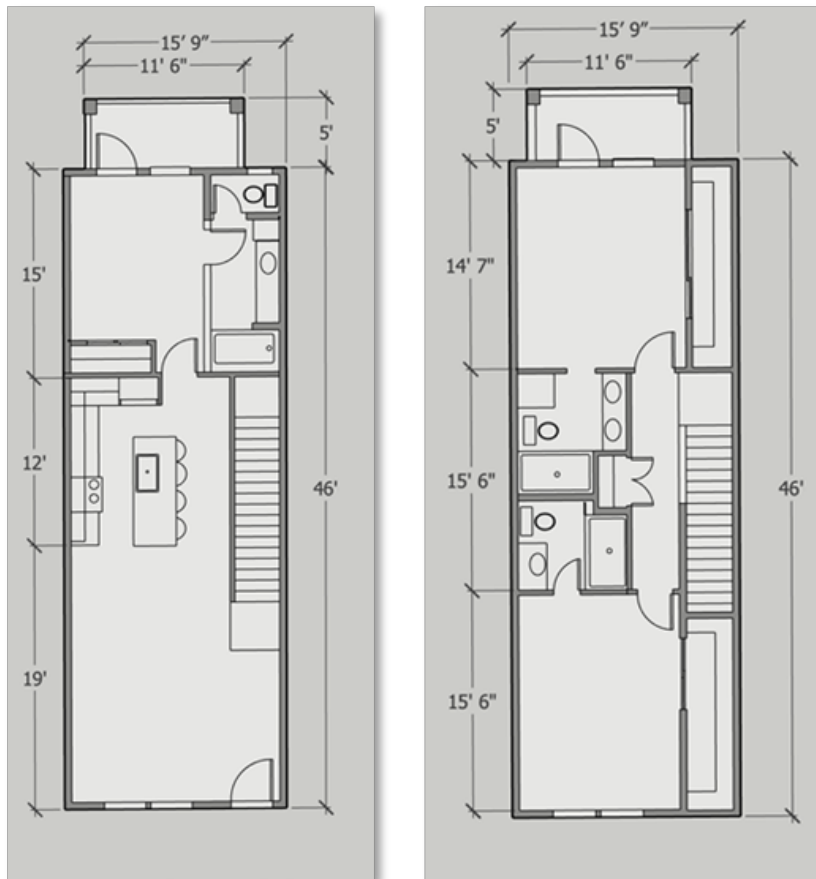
ONX sample floorplan for 1,470-1,600 SF, from 2/2 to 3 bed/3 bath units
